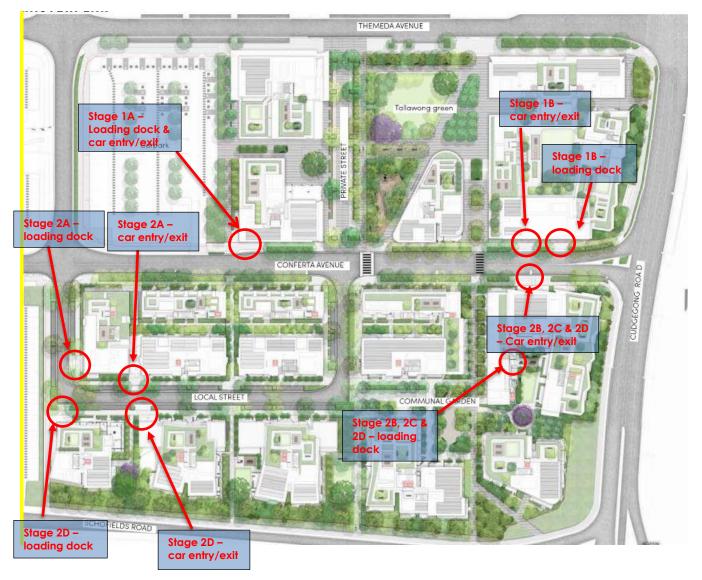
Extract from Landscape Plans showing the location of vehicle crossings within the development.
